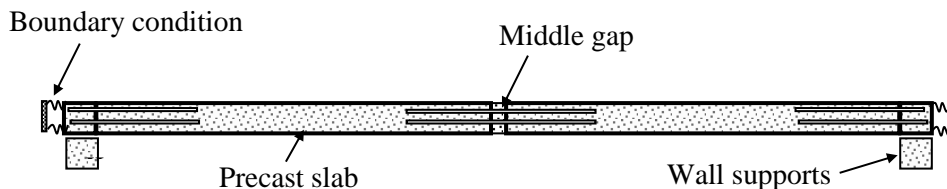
Floor-to-floor joint with top and bottom tie bars
